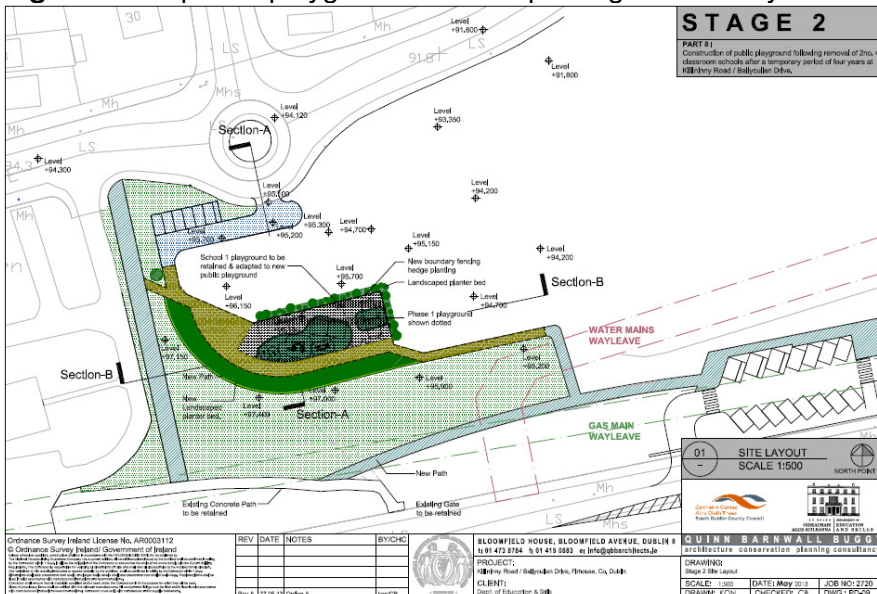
Proposed playground and car parking at Killininy Road / Ballycullen Drive
